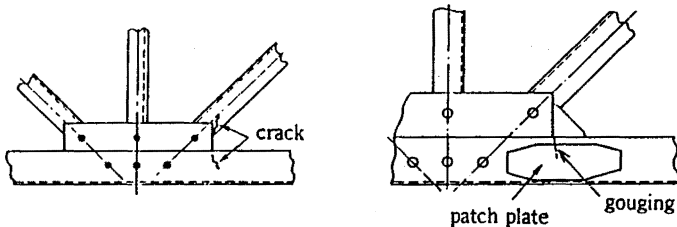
Cracks at the auxiliary girder and repair method.
